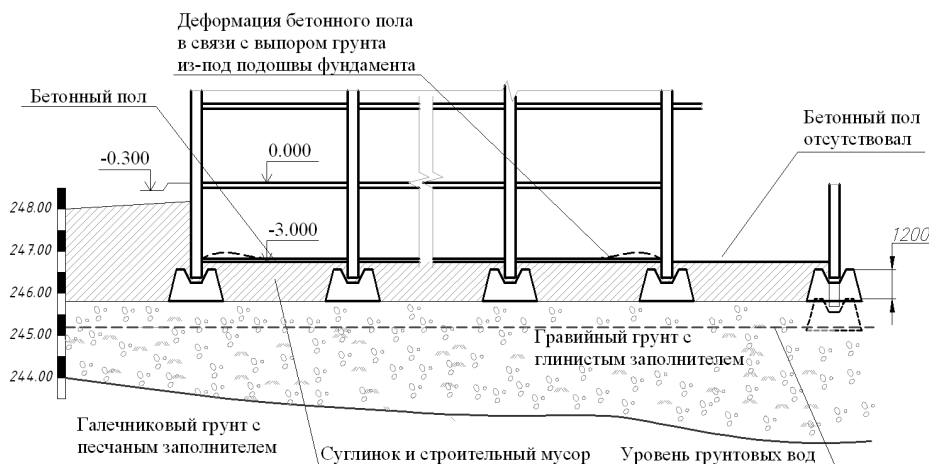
A fragment of the cross-section of State Technical College -59 building including soil profile.
